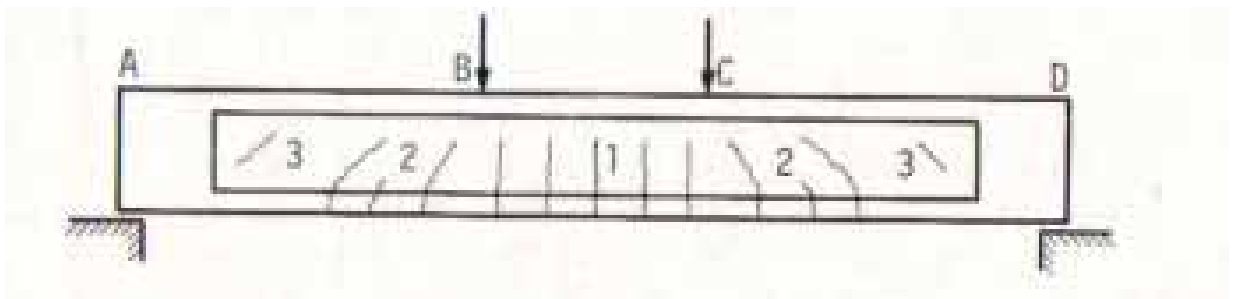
Types of cracking (Source: Faulkes et al., 1979)
